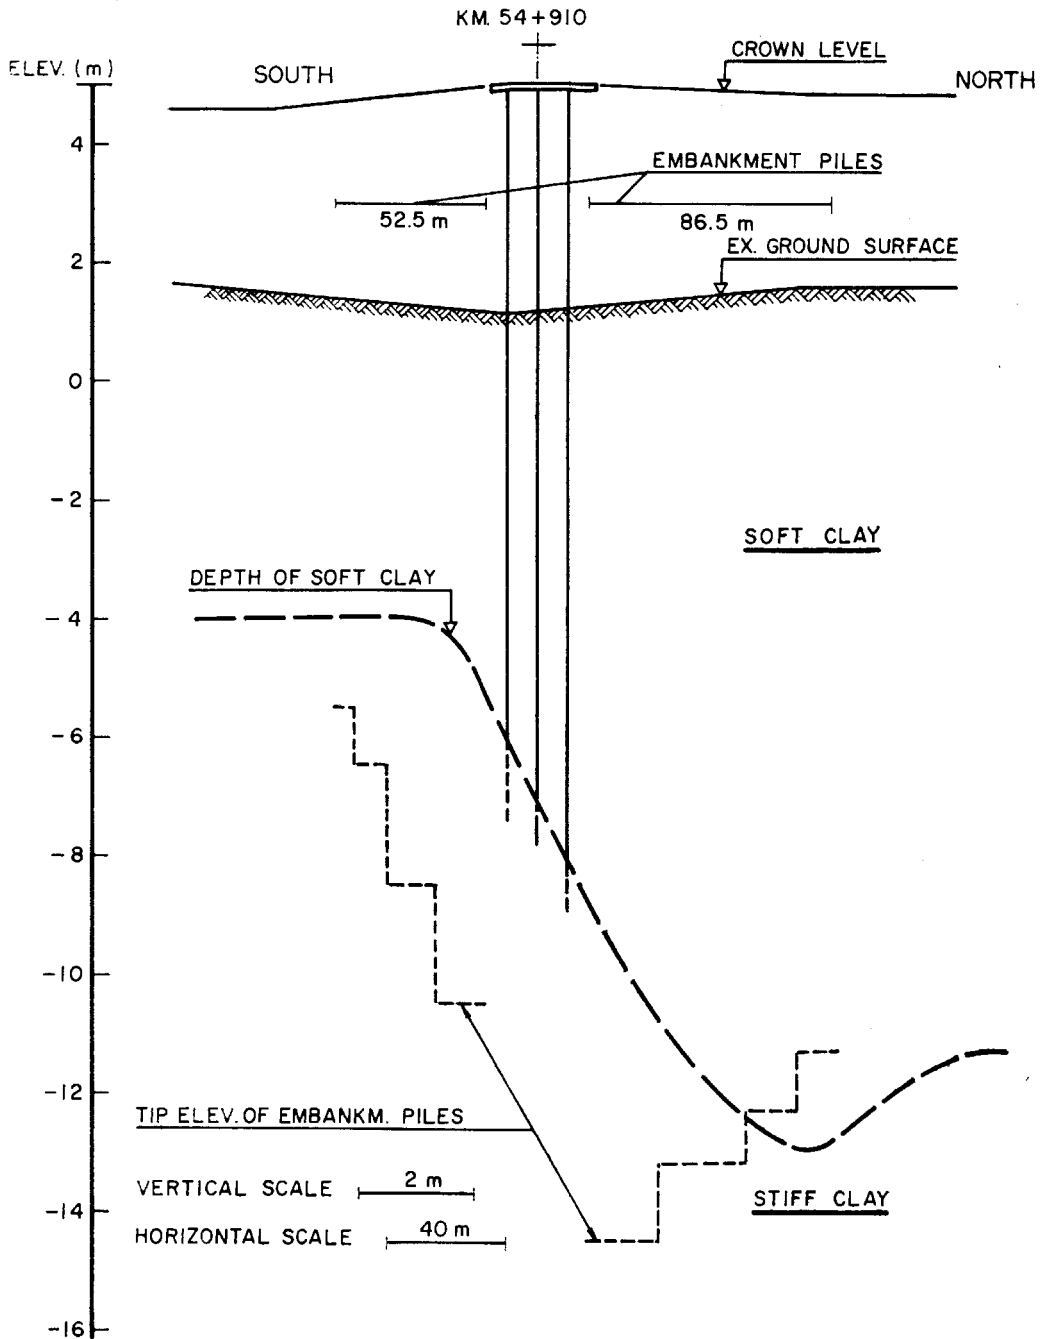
B.idge at km 54 + 910; longitudinal profile.
